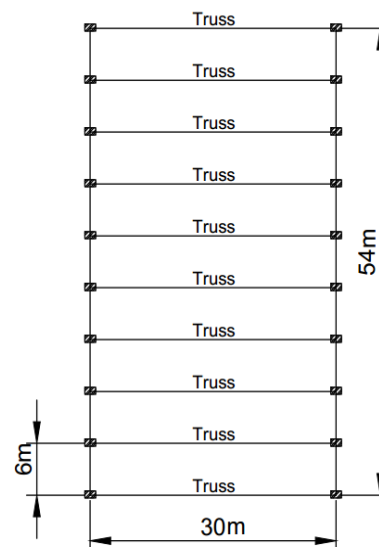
3 Plan view of building layout for Plan A and Plan B
